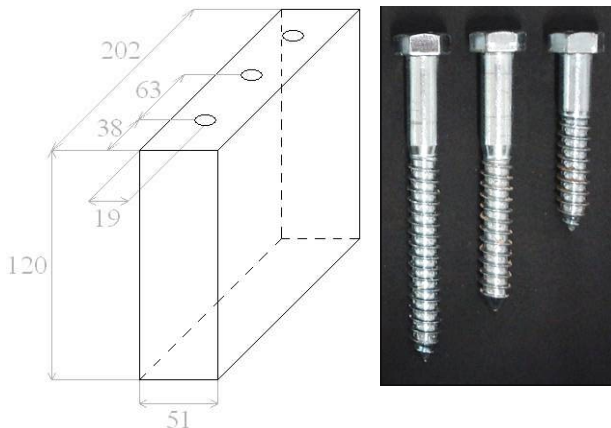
Samples dimensions (mm) and general overview of lag screws used.
